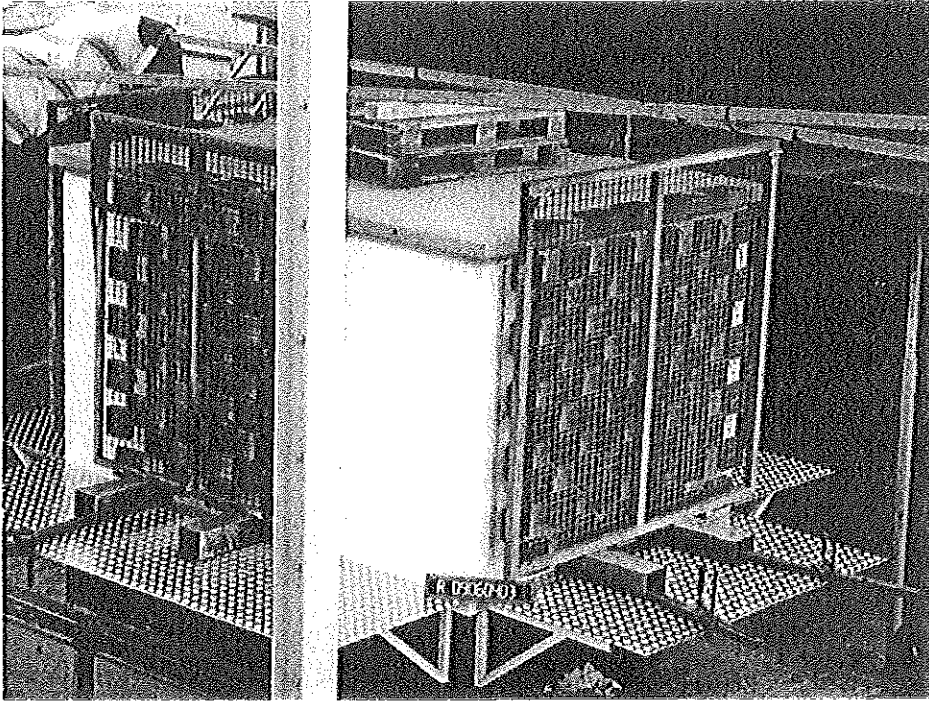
Upper side view of the test object with indicators before test no. 090604-03
